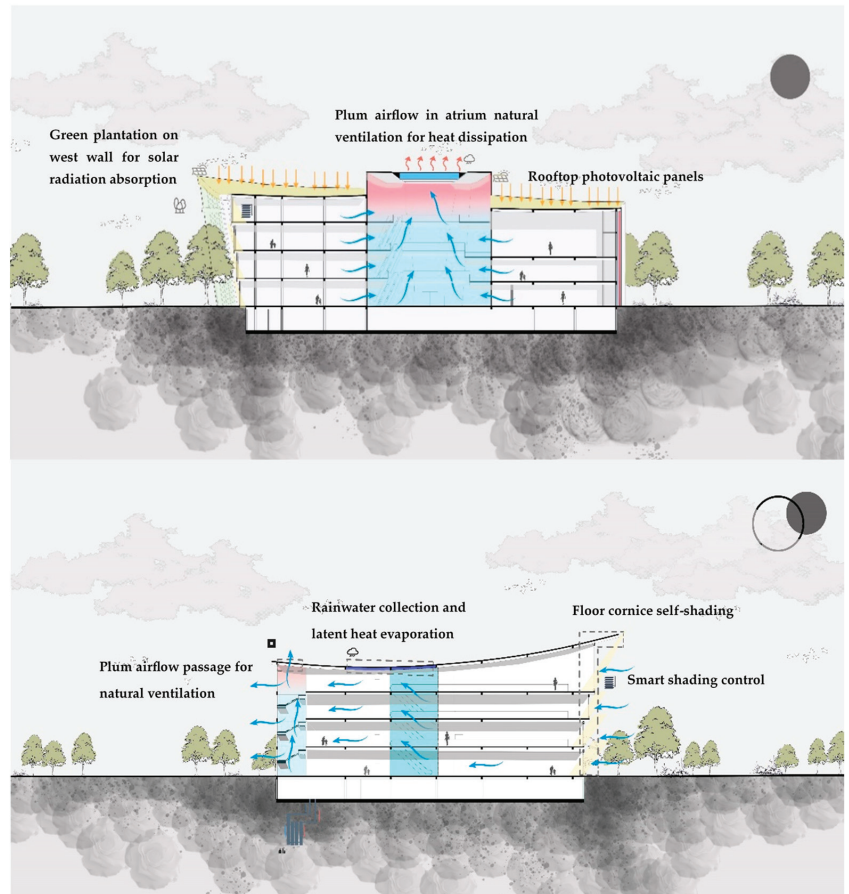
Architectural design details with floor layouts and external façades (drawn by authors).
